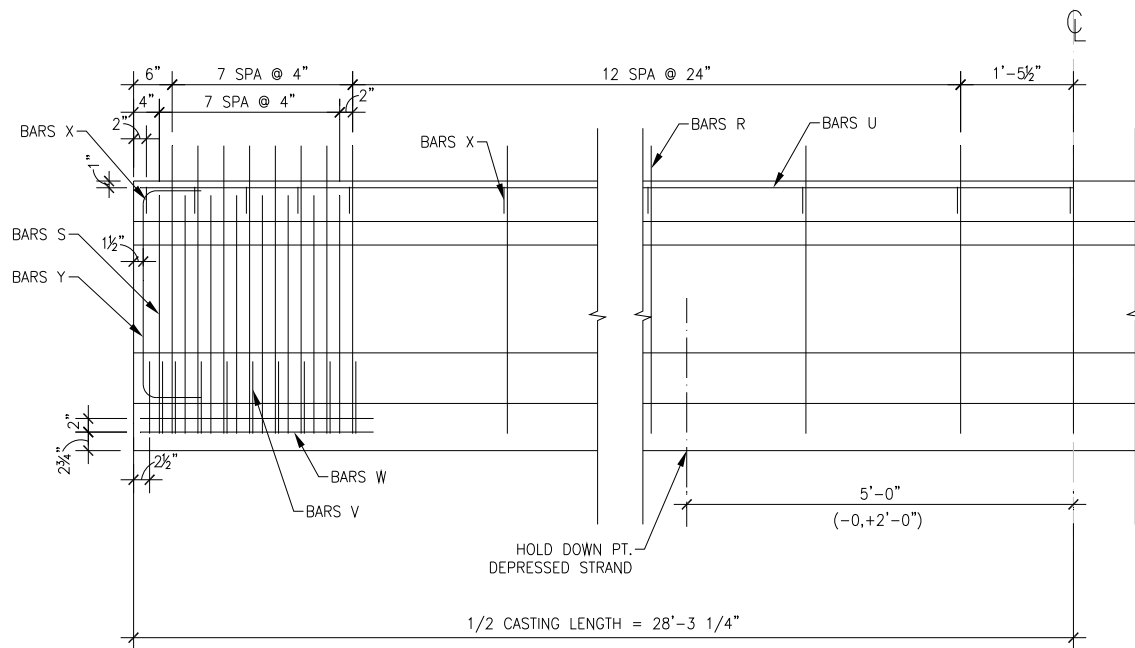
Modified Shear Reinforcement Design: Project 5197 C-Beam Specimens
